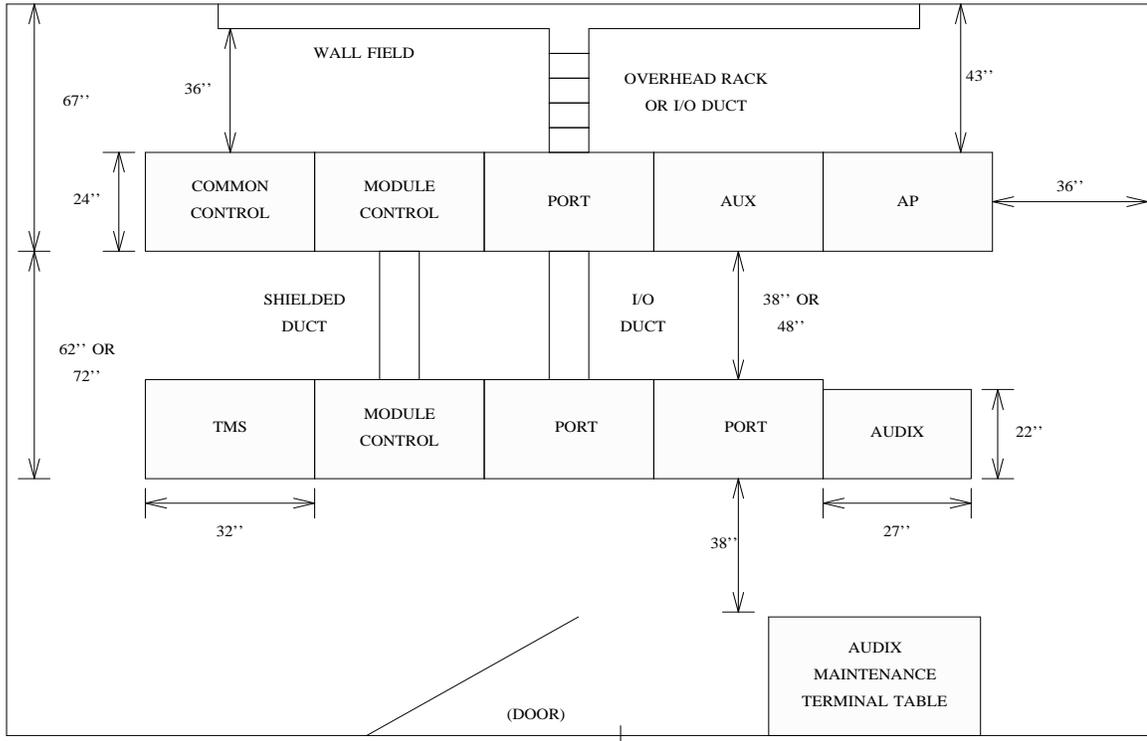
Floor Plan for Local AUDIX System and Generic 2 or Generic 3r
